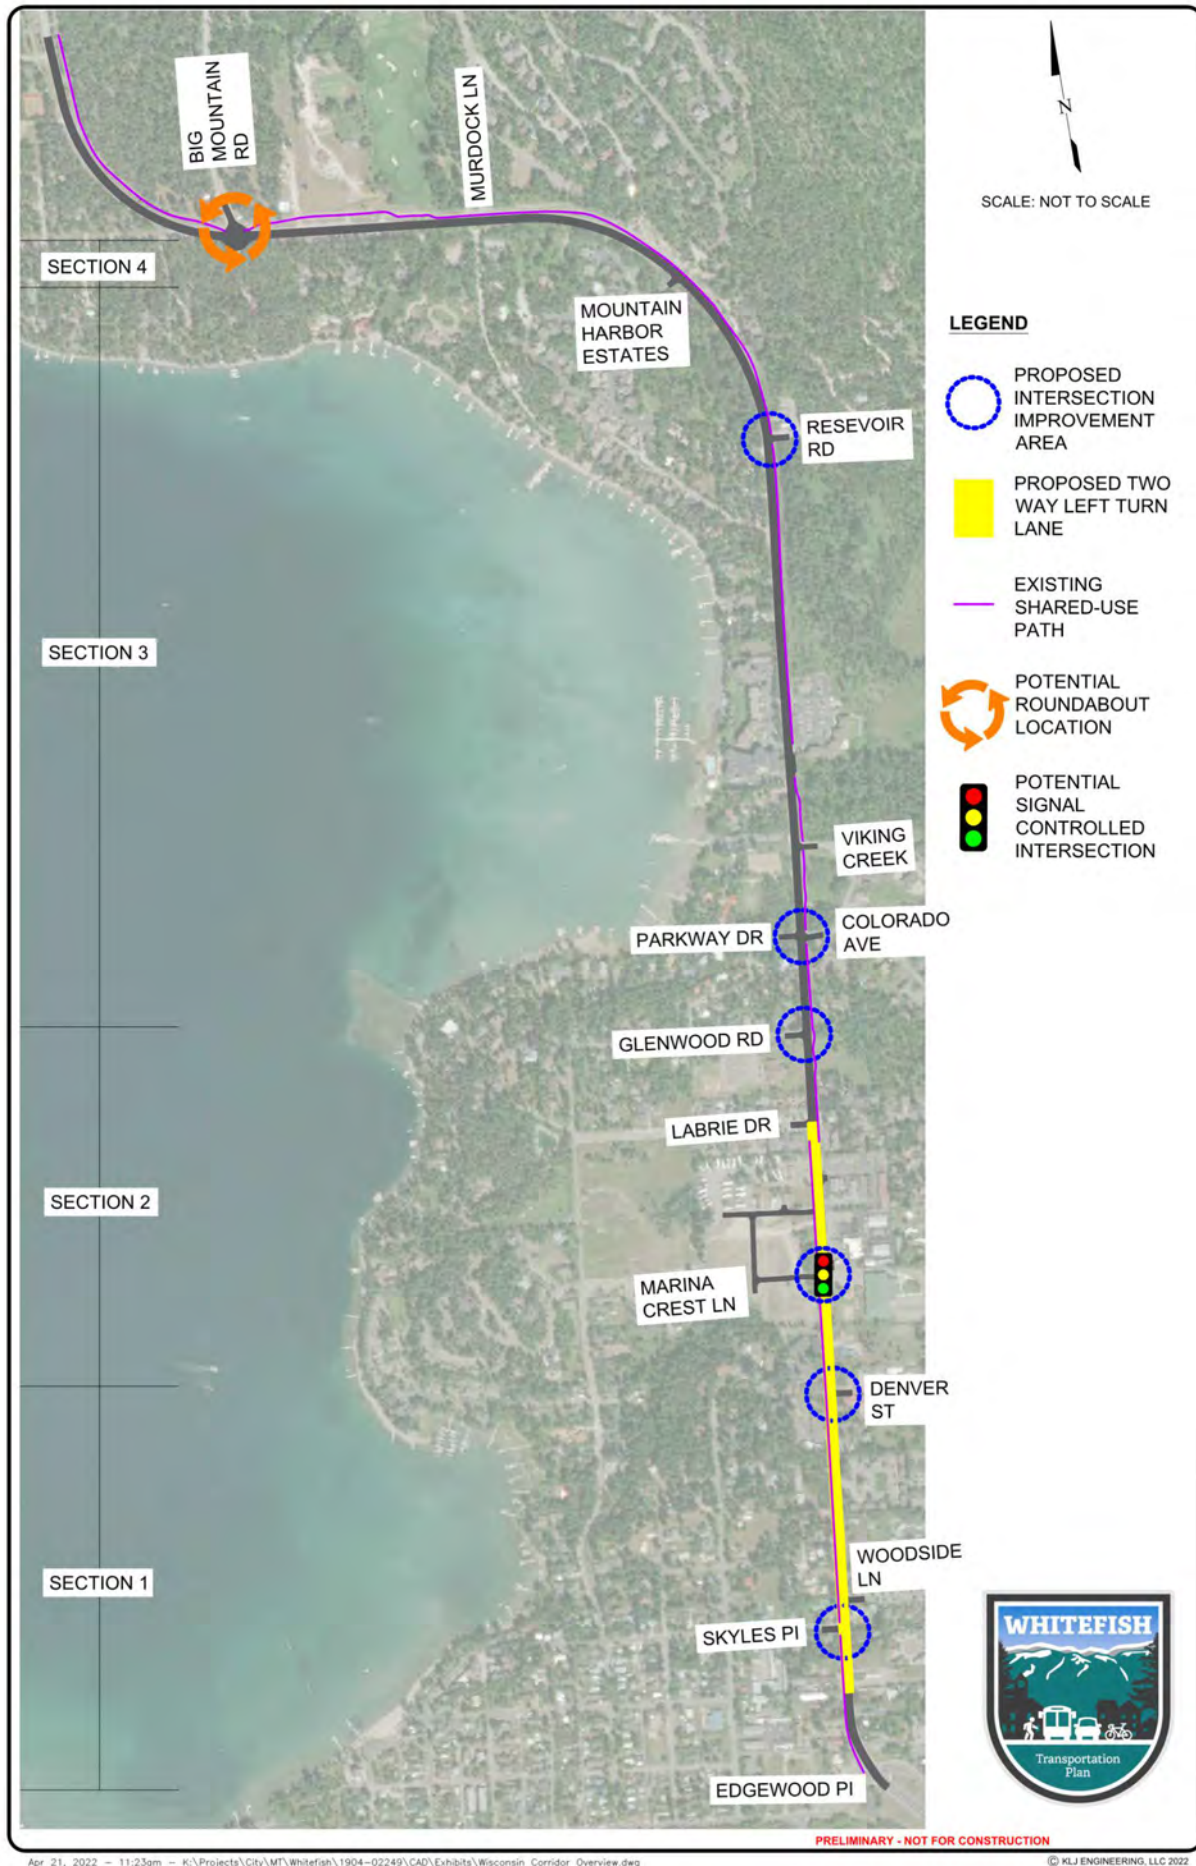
WISCONSIN AVENUE CORRIDOR PLAN AREA
